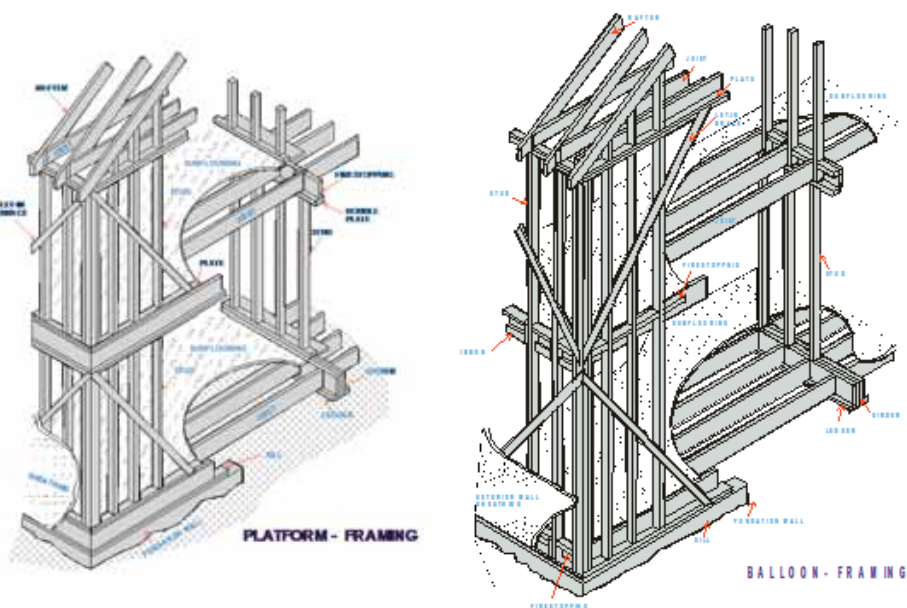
System of wood-framed buildings: a) platform, b) balloon
